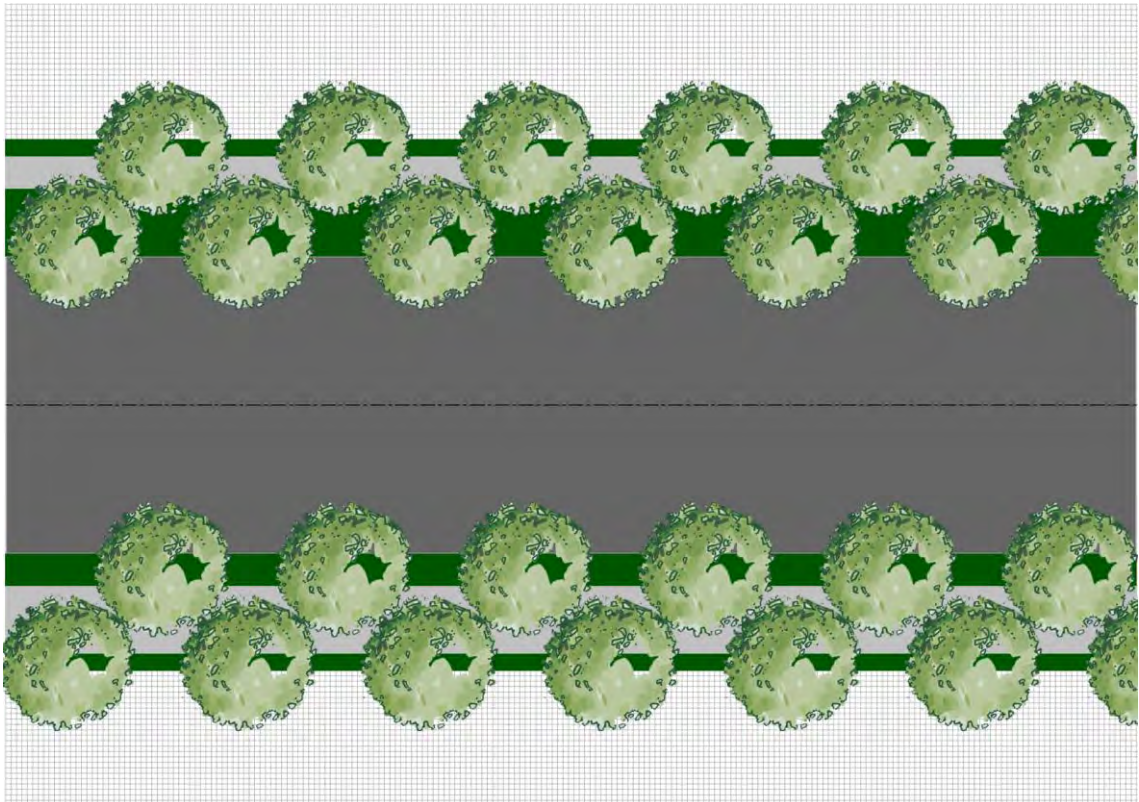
Continuous Street Tree Canopy – Collector Road [4.3-11.0-4.3]
